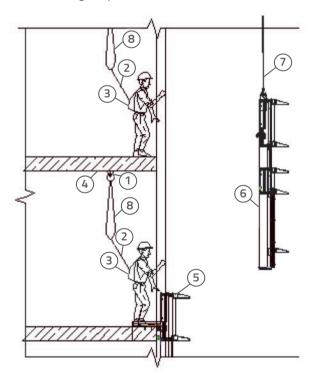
Anchor attached to the ceiling: 1 - anchor, 2 - lifeline; 3 - body harness, 4 - ceiling, 5 - a mounted façade element, 6 - a façade element to be mounted, 7 - sling, 8 - belt/loop attached to a lifeline
